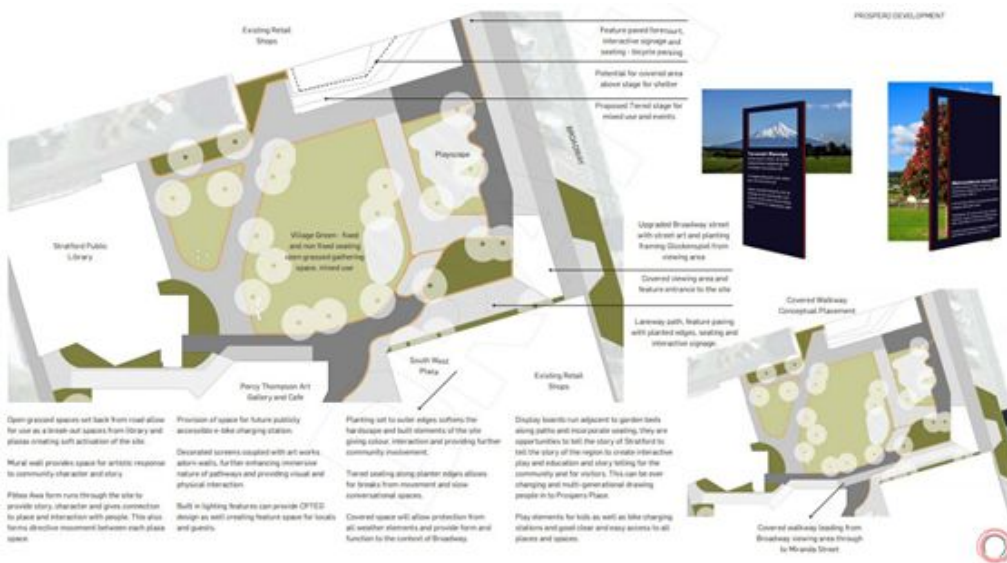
DGSE detailed concept plan for Prospero Place Northeast plaza.
